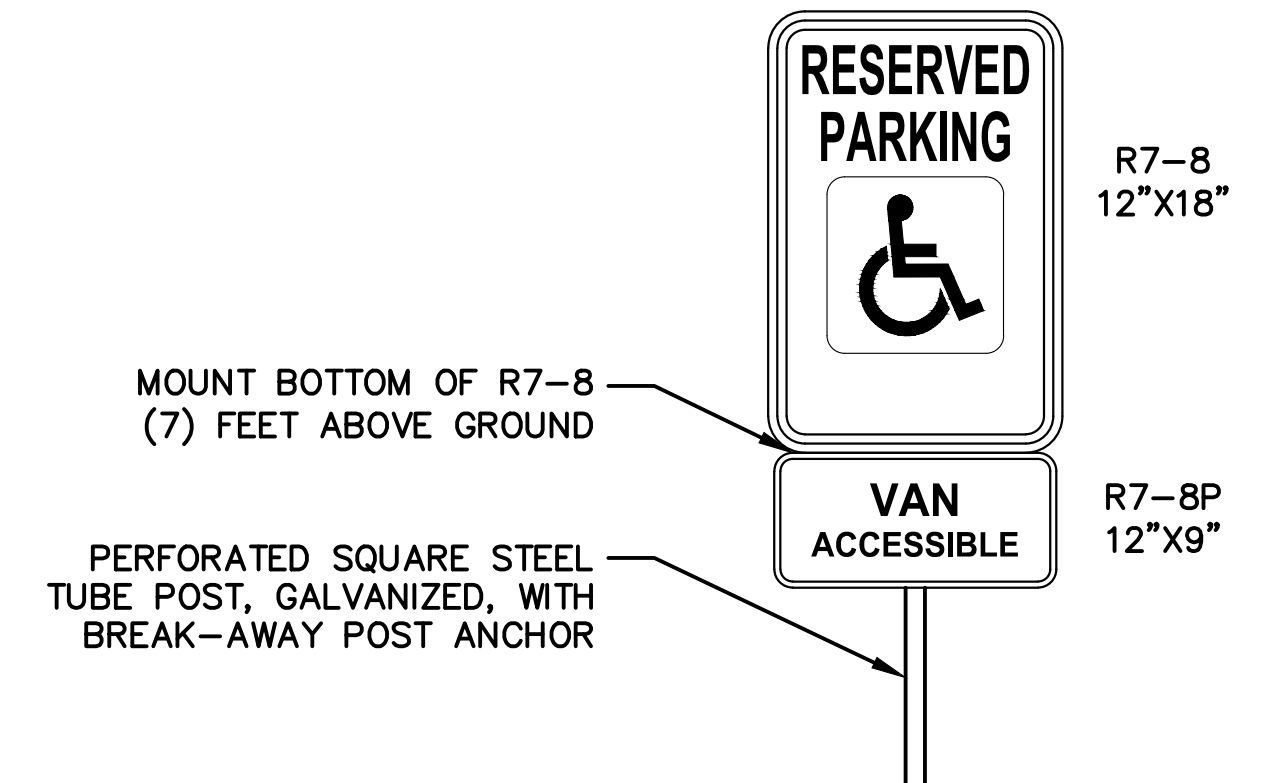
STANDARD ROAD PLAN SW-401
